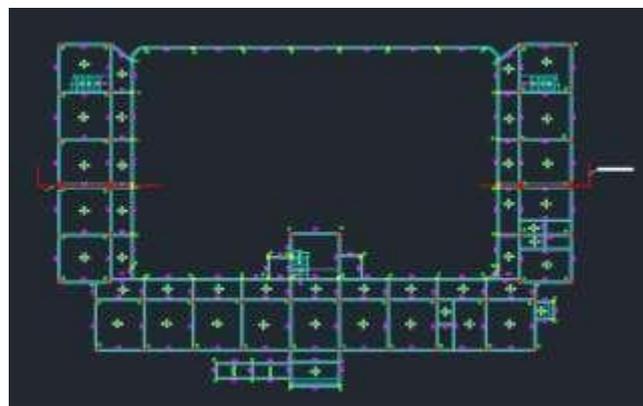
AutoCAD plan of Structure is considered with expansion joint.
